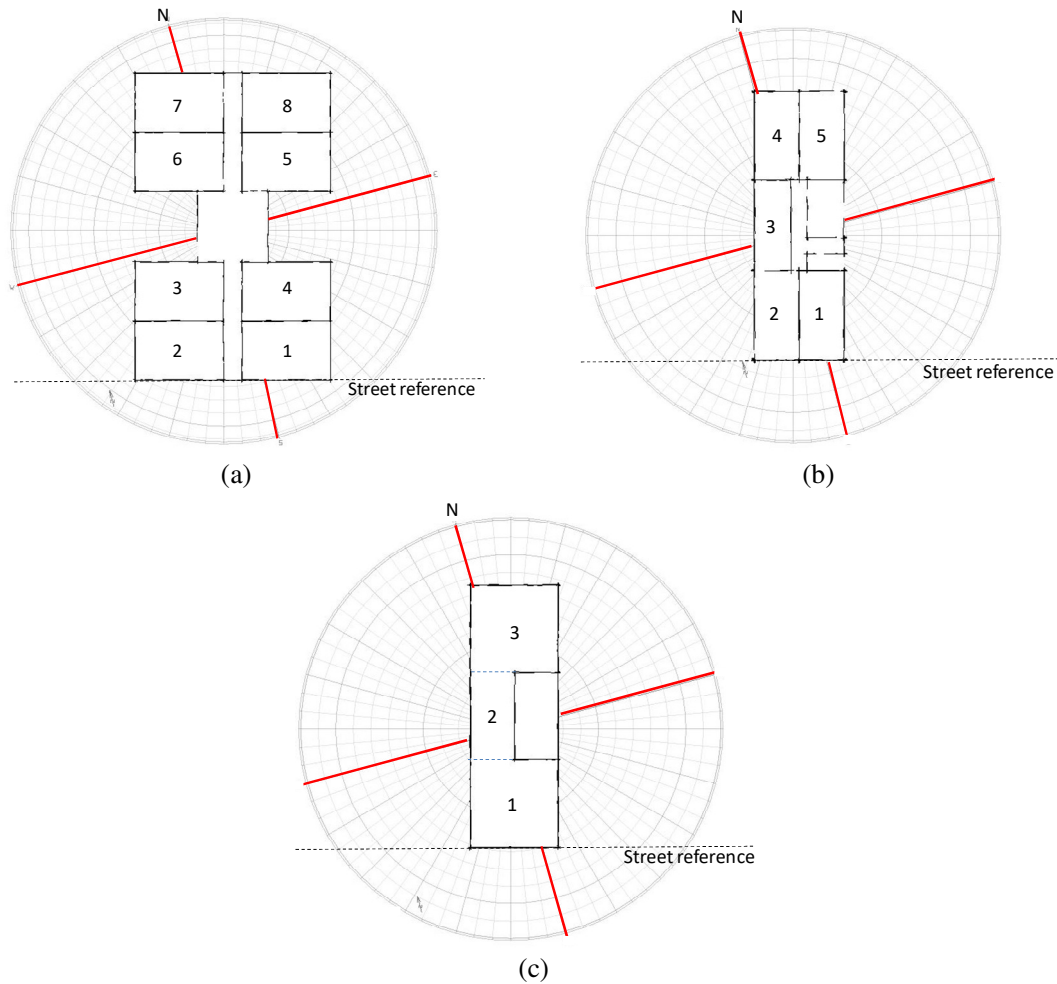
Floor zone subdivision: (a) Archetype I, (b) Archetype II and III_A (c) Archetype III_B
